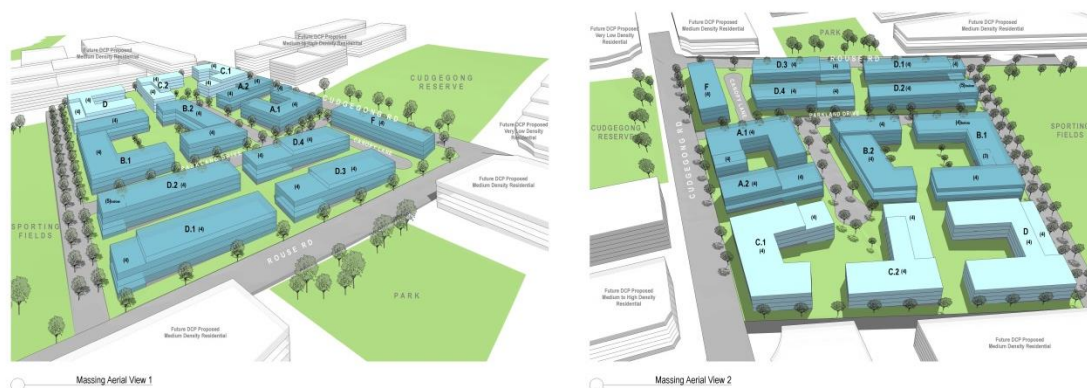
and 5 – Site Concept A showing building footprints and massing model at 12m.
